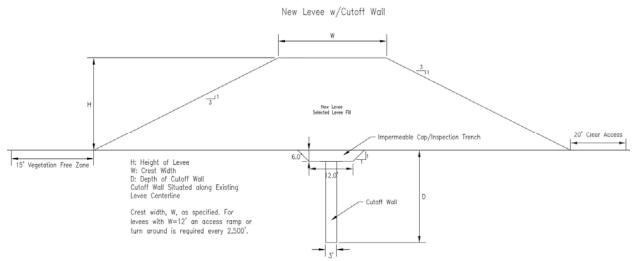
Template Option 9 – New Levee with Cutoff Wall
